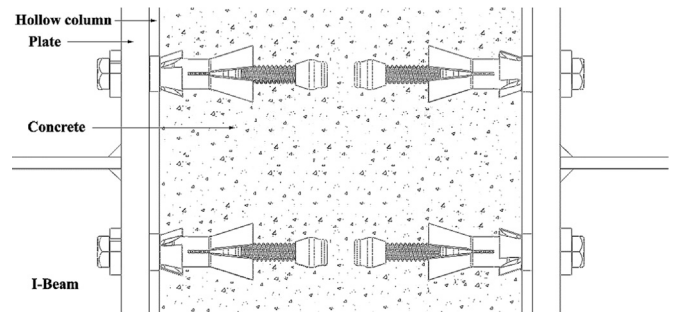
Side view of the Beam to CFT column TubeBolt connection.
